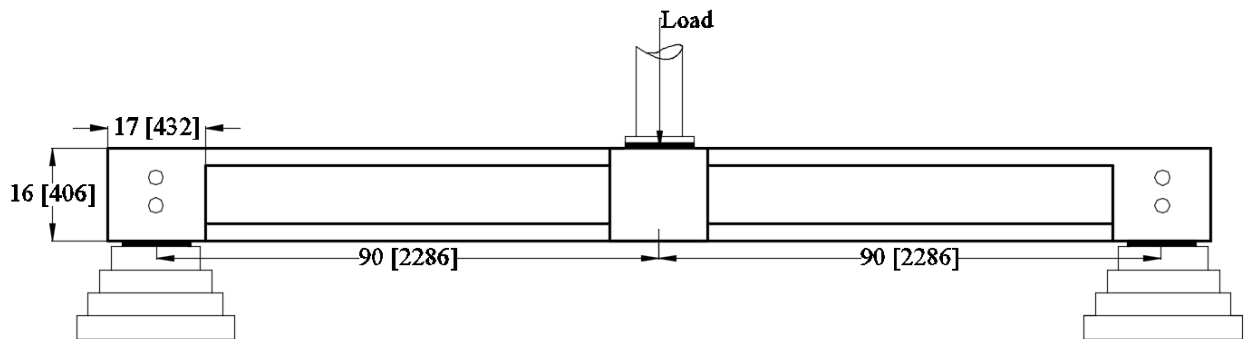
Sketch of test set-up, all dimensions are in in. [mm]
